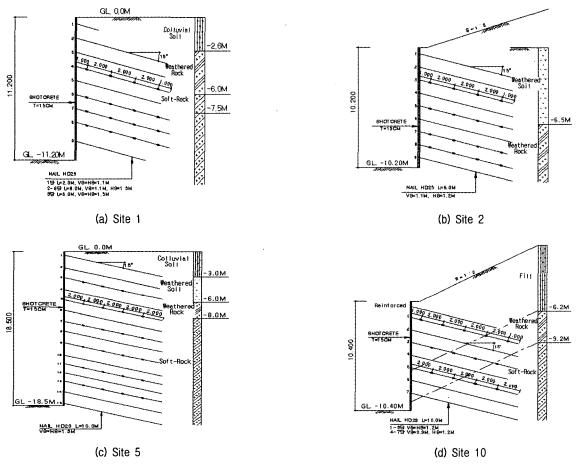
Cross section and soil profile of representative site(Jeon, 1999)
